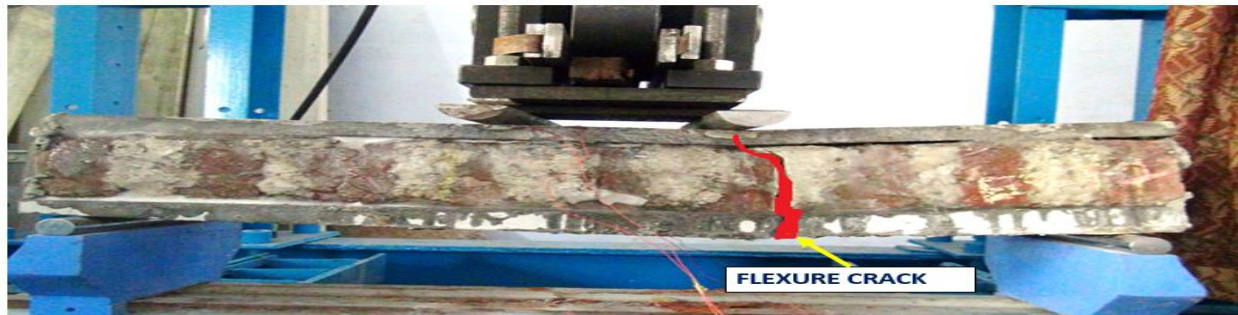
Failure of sandwich beam with epoxy as bonding agent
